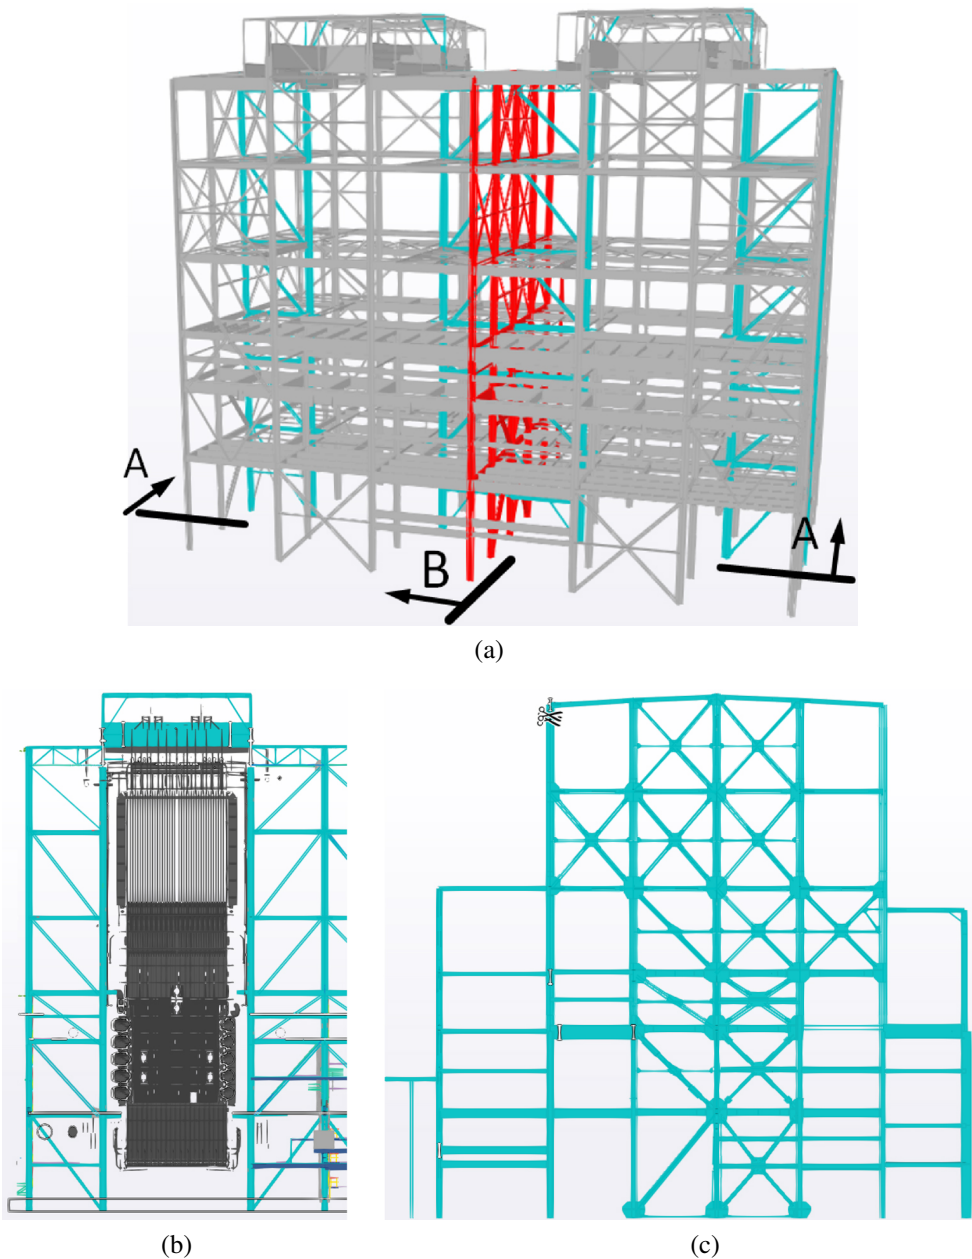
Construction of boiler room section with a boiler hanging at +60 m: a) View on a segment of blocks 5–6 (elements visible in the cross-section are marked in colour), b) Cross-section A–A, c) cross-section B–B
